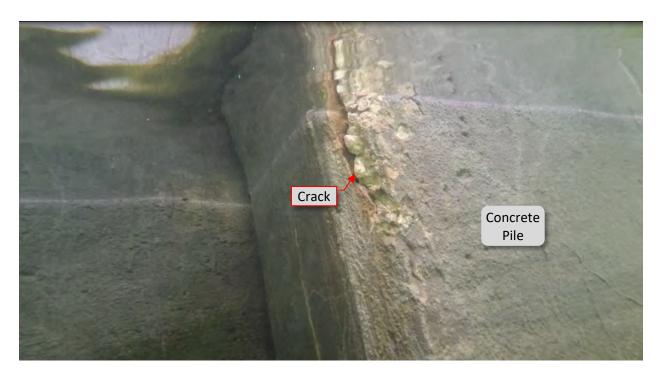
P17. STA 3+63. Crack at west top of flange at pile. Underwater view.
